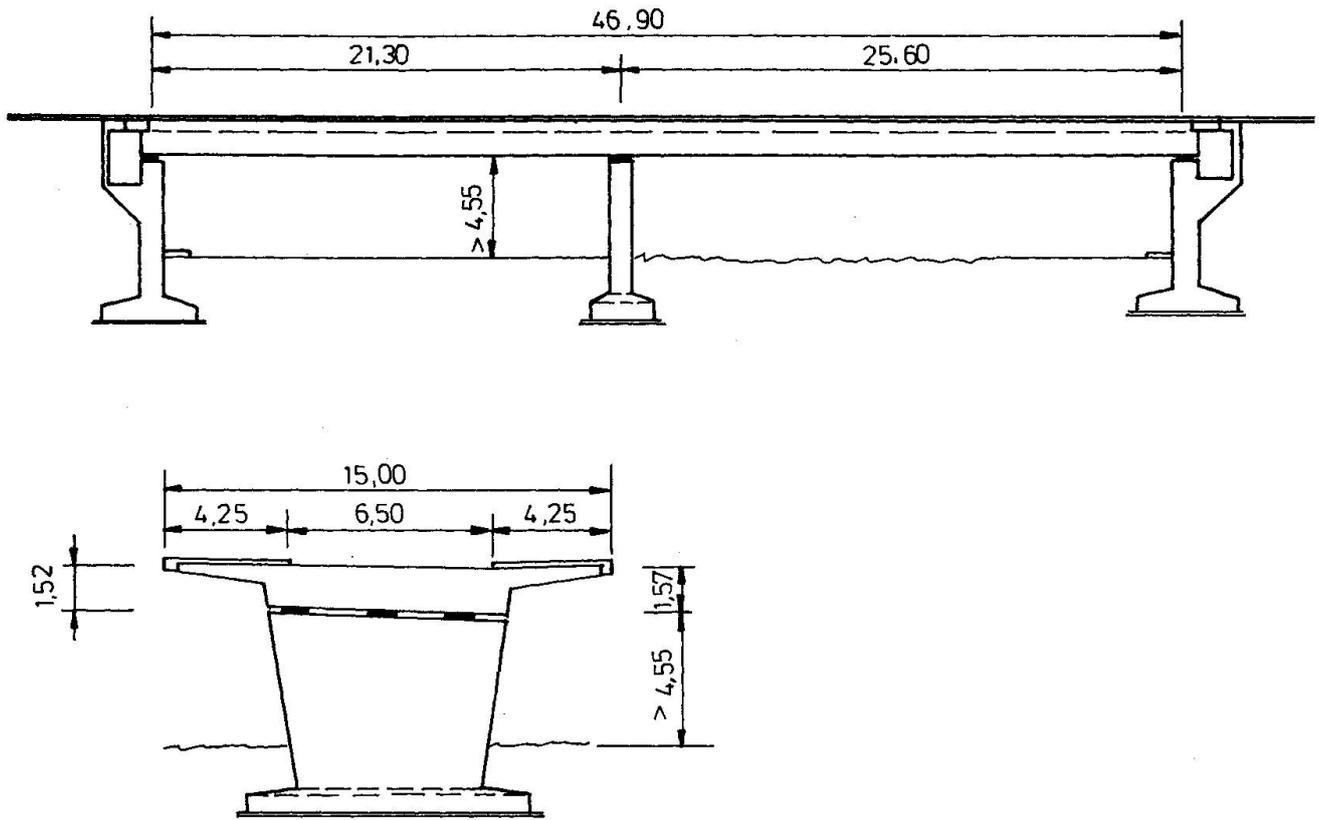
Bridge Ulenbergstraße, Longitudinal and cross sections
